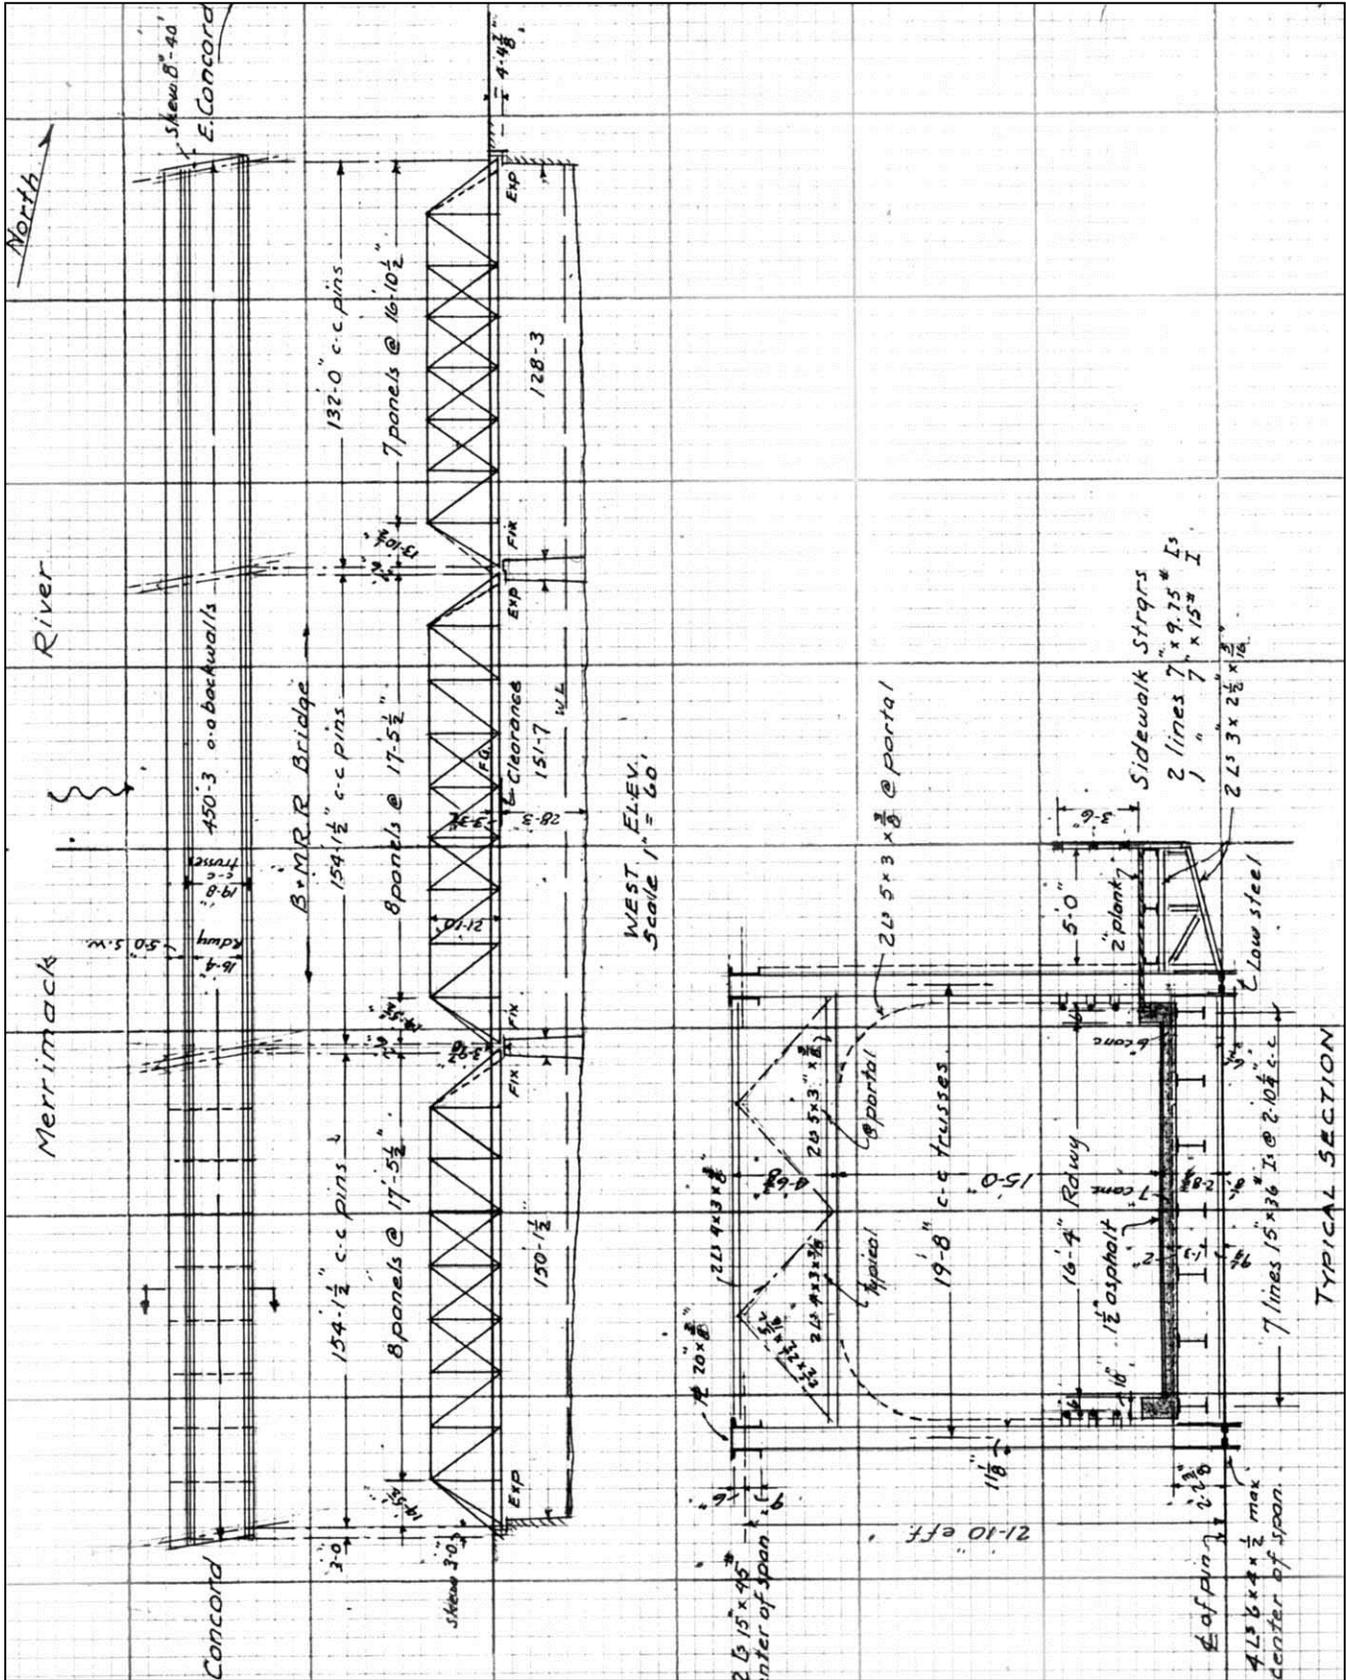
Concord 136/115, Federal Bridge (1915). Plan, elevation and section sketch made by NHHD engineer Wendell H. Piper, c.1940 (NHHD Bridge Inventory Card).
